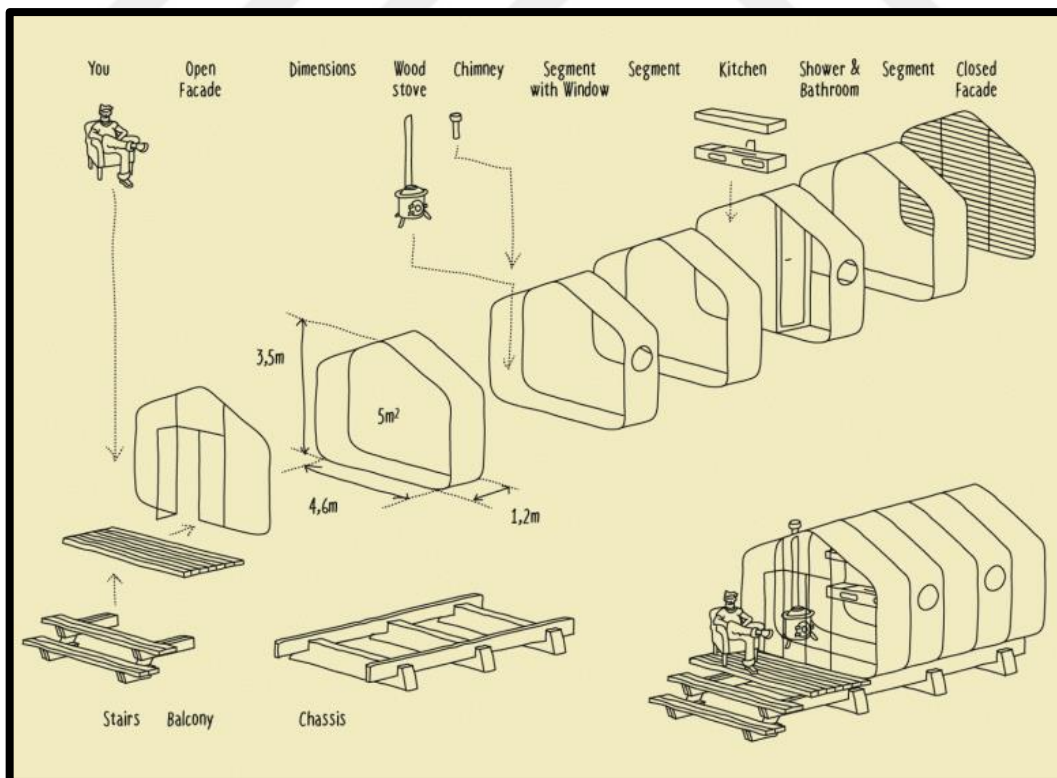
Shows How Wickelhouses Are Pieced Together out of Individual Modules, Like Building Blocks (Meilani, 2019).
